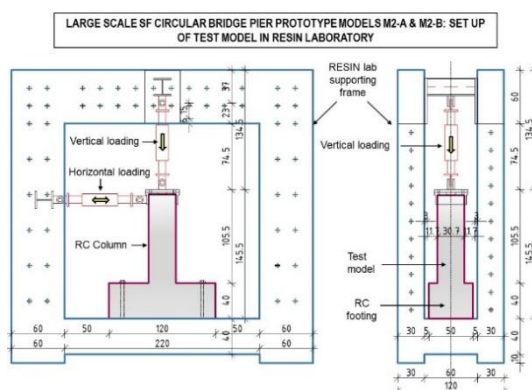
Set-up of the shear failure circular RC bridge pier models M2-A and M2-B in the RESIN laboratory testing frame.
